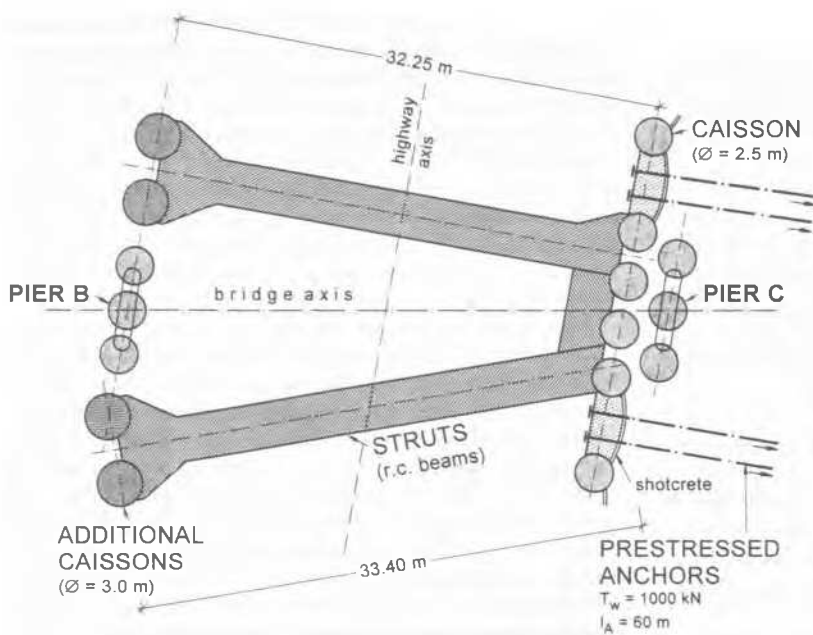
Partial view of the ground plan to Fig. 18 showing the reinforced concrete beams strutting the caissons against each other on the right and left toe zone of the slope cut, as well as the additional caissons and the prestressed anchors.
